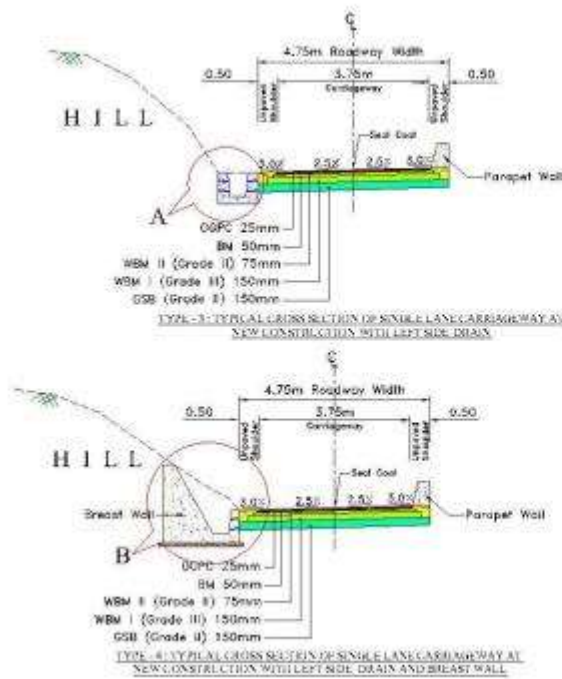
Typical Cross-Section of Single Lane carriageway at New Construction with Right side Drain and Breast Wall.
